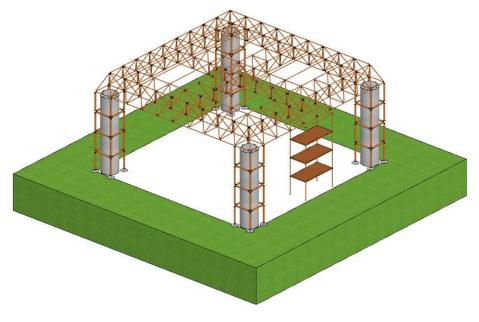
3D showing the construction of the first axe of the roof space frame structure
